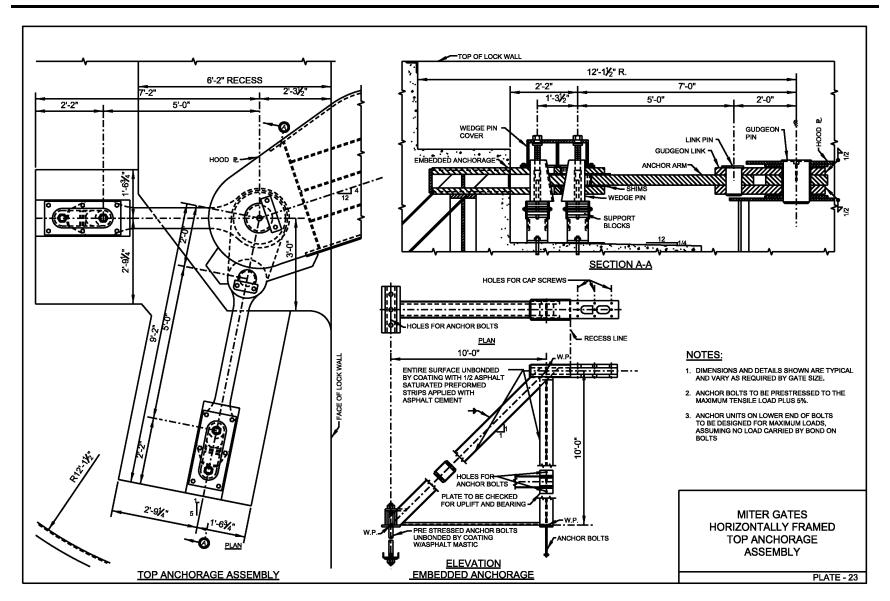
Plate 23: Miter gates, horizontally framed, top anchorage assembly
